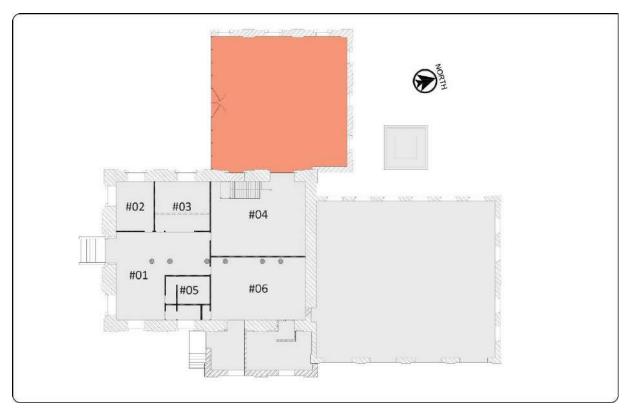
Location of the Western Pumphouse within the Main Pumping Station. Base plan provided by MCC.
